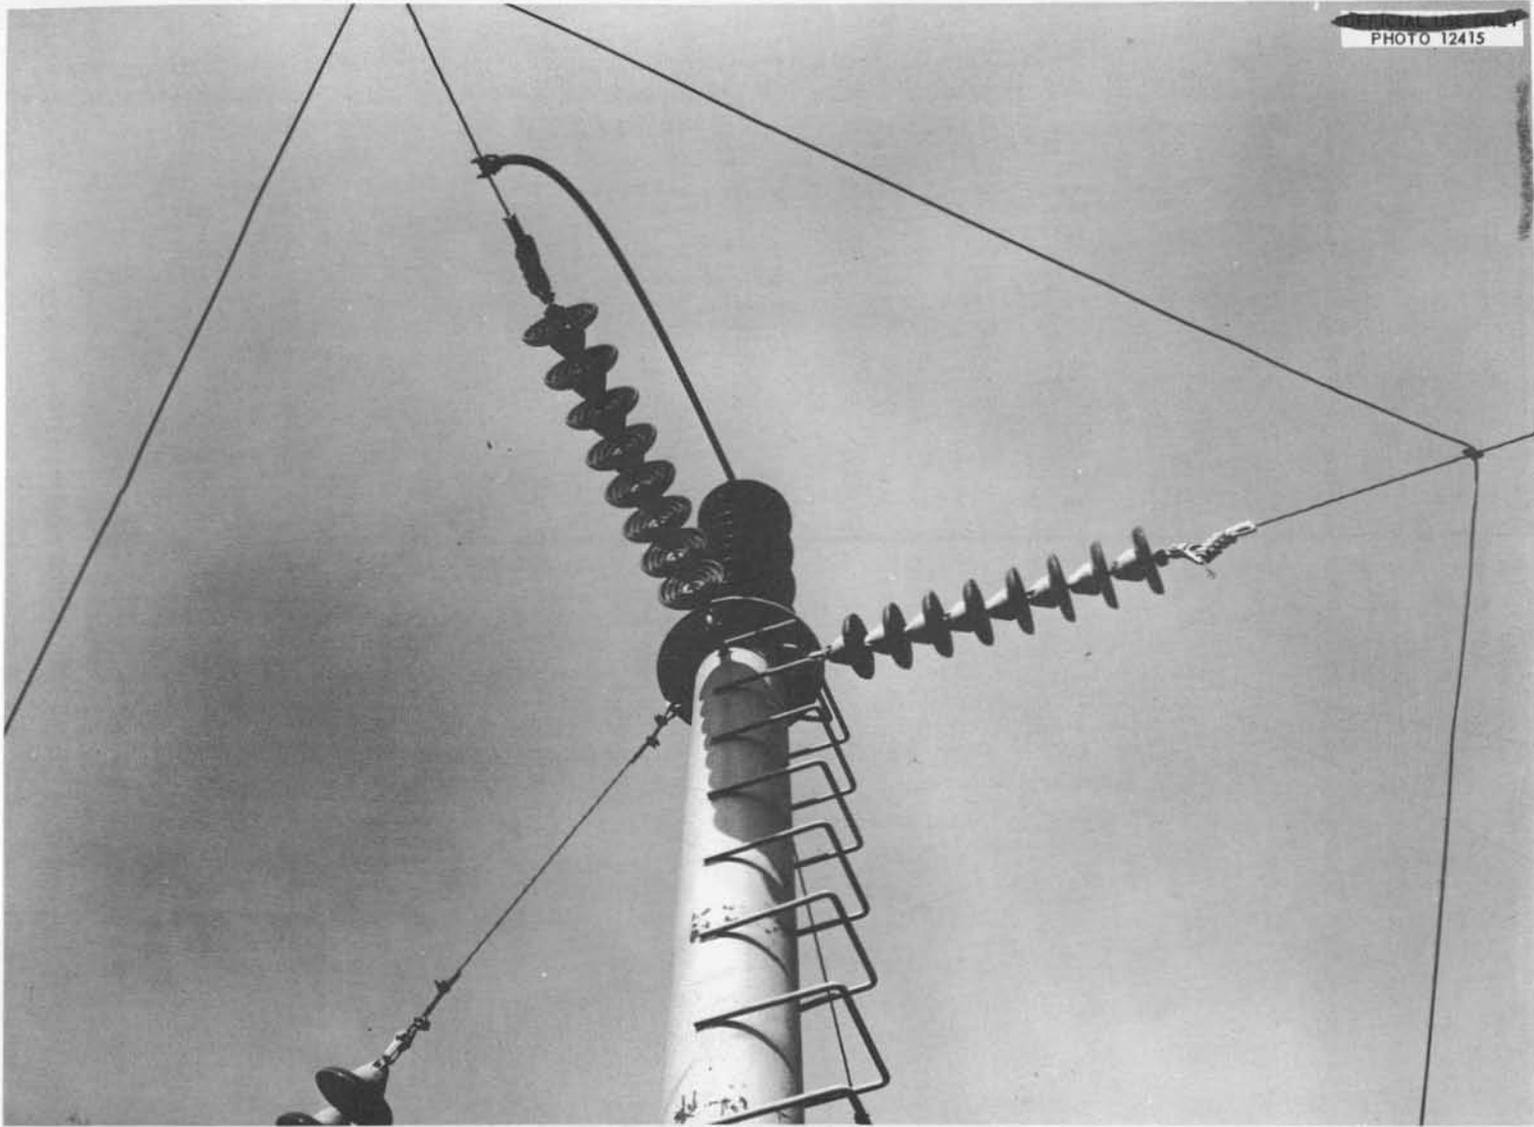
Typical Lightning Protection – Top of Tower Leg IV.
